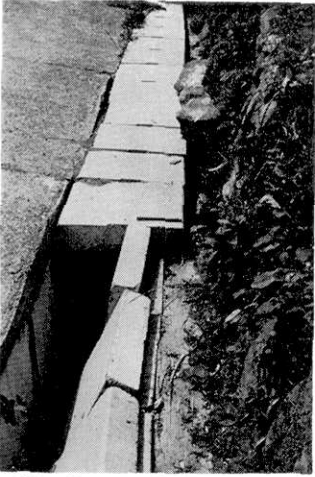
Damaged ditch on the fault line at Loc. N-5.
